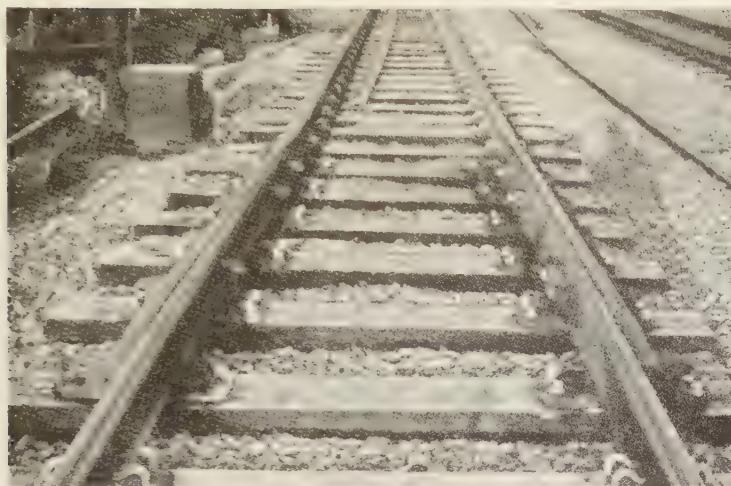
Adjustment switch for de-stressing long welded rails at Llanwern.
